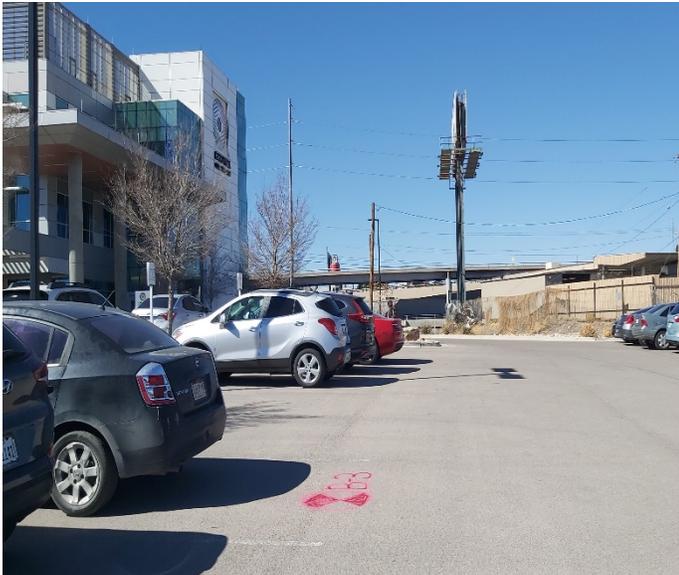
General north view of box culvert route and existing conditions at vertical boring B-3.
